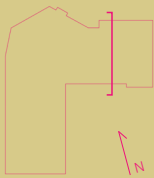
Facade drawing South-Southwest 1:200. (Randers Tegl, N.d.), (Meye, N.d.), (Nonscandinavia, N.d.)
